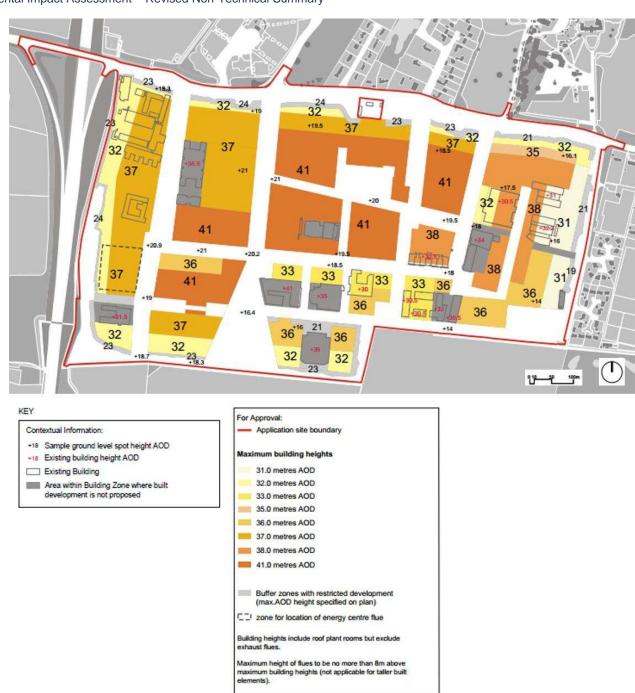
Alternative height parameter plan with reduced building heights and removal of the taller built elements.
